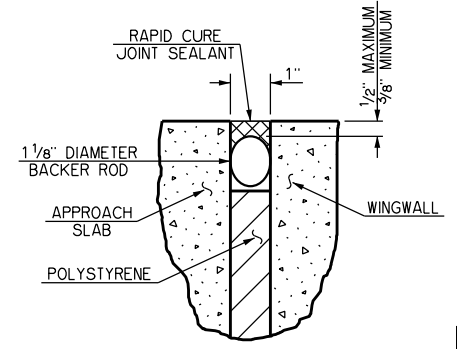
DETAIL OF APPROACH SLAB AT ABUTMENT WING
